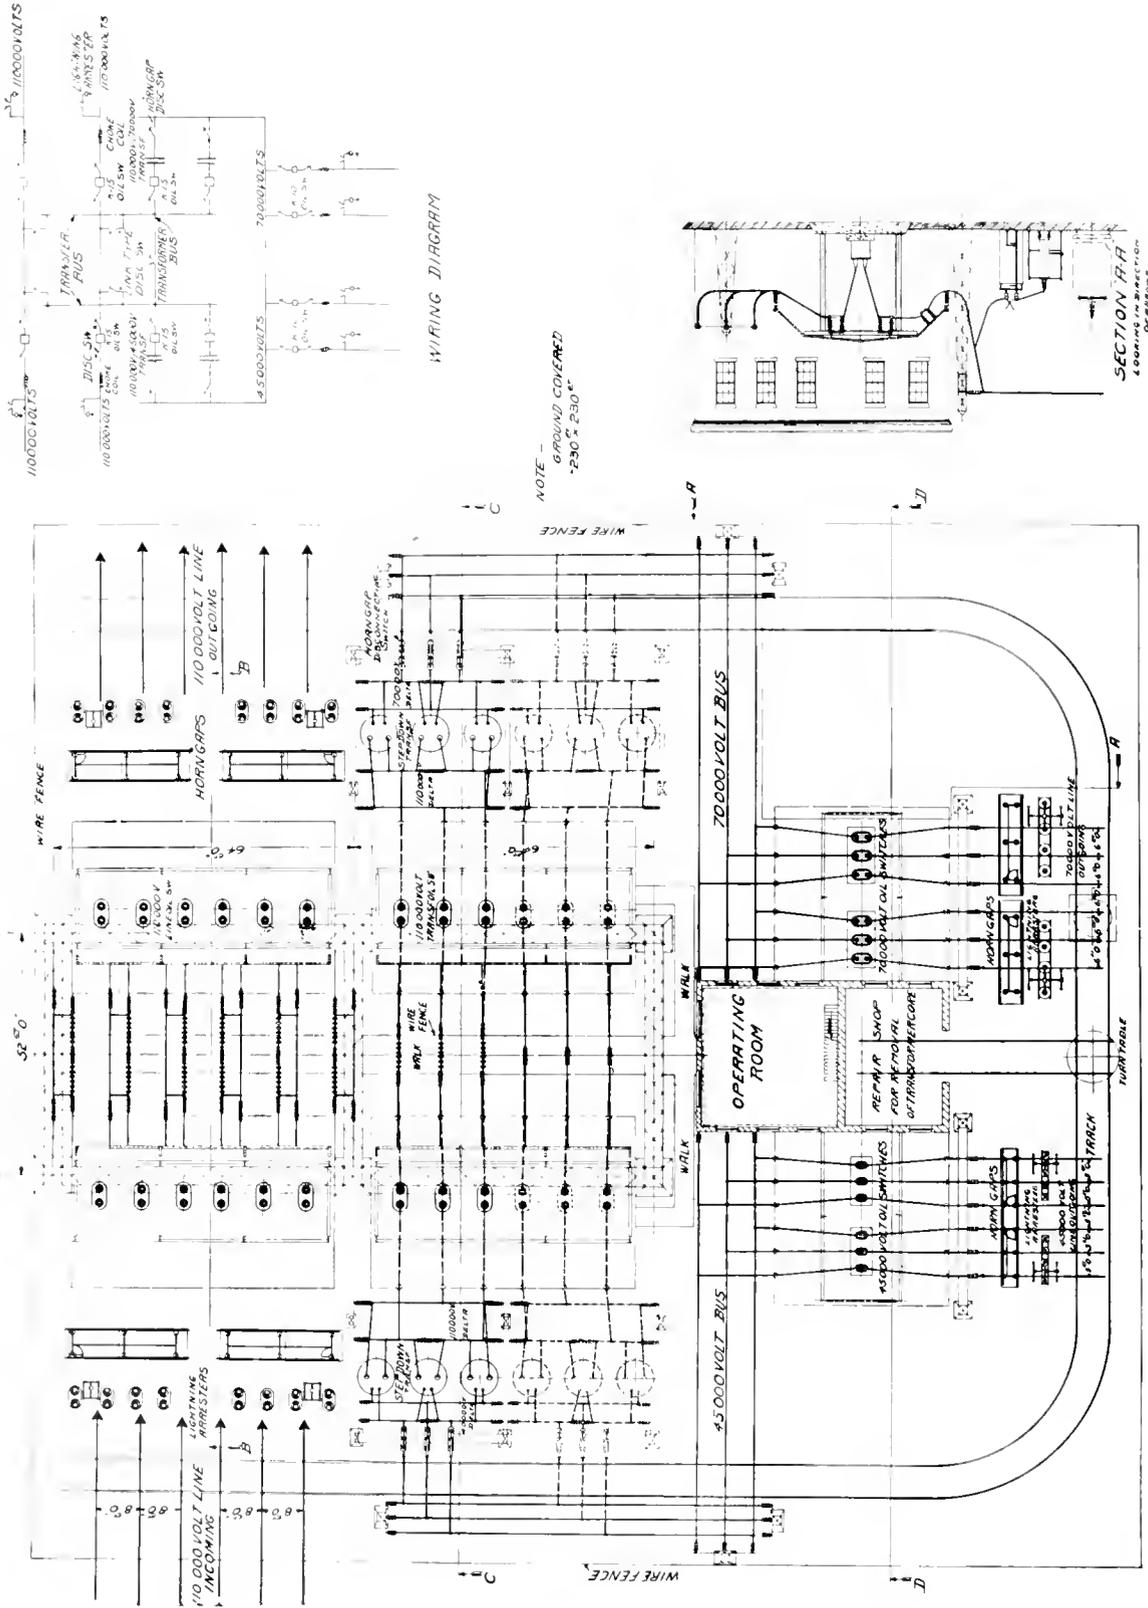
Plan of Semi-Outdoor Substation, for 110,000/45,000 Volt Circuits
